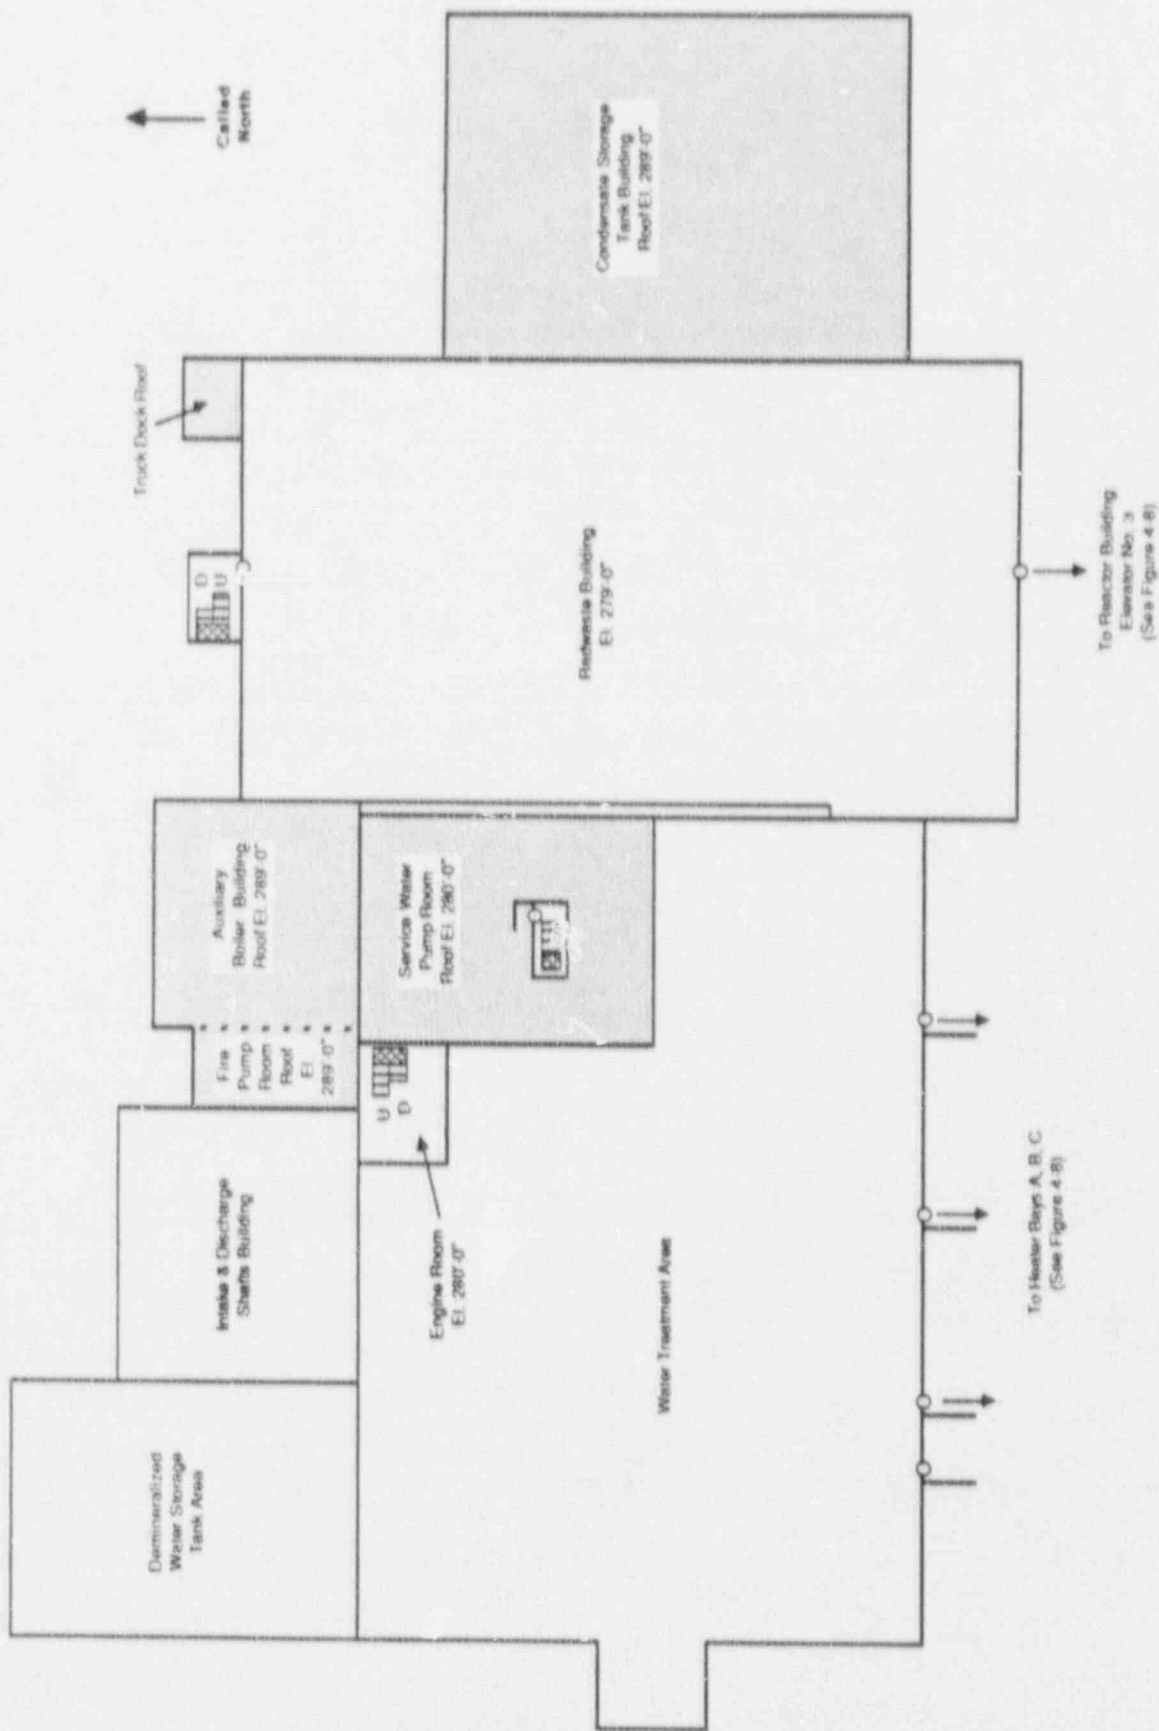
Nine Mile Point 2 Condensate Storage Tank and Adjacent Buildings, Elevation 289'-0"
